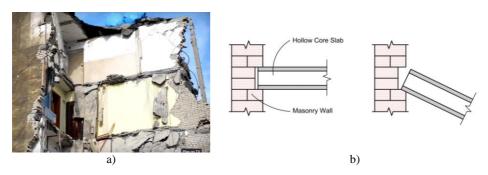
Collapse of mid-rise URM buildings in Thumanë, Albania: a) partial collapse of the building caused by the collapse of the floor slabs and b) detail of a simply supported hollow-core slabs
